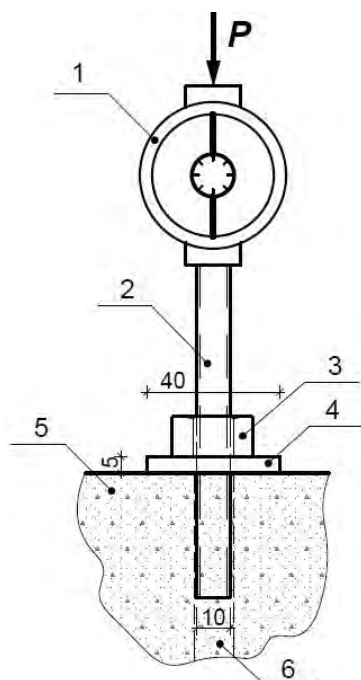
Side view of steel plate anchor in cellular concrete block masonry loading experiment:
